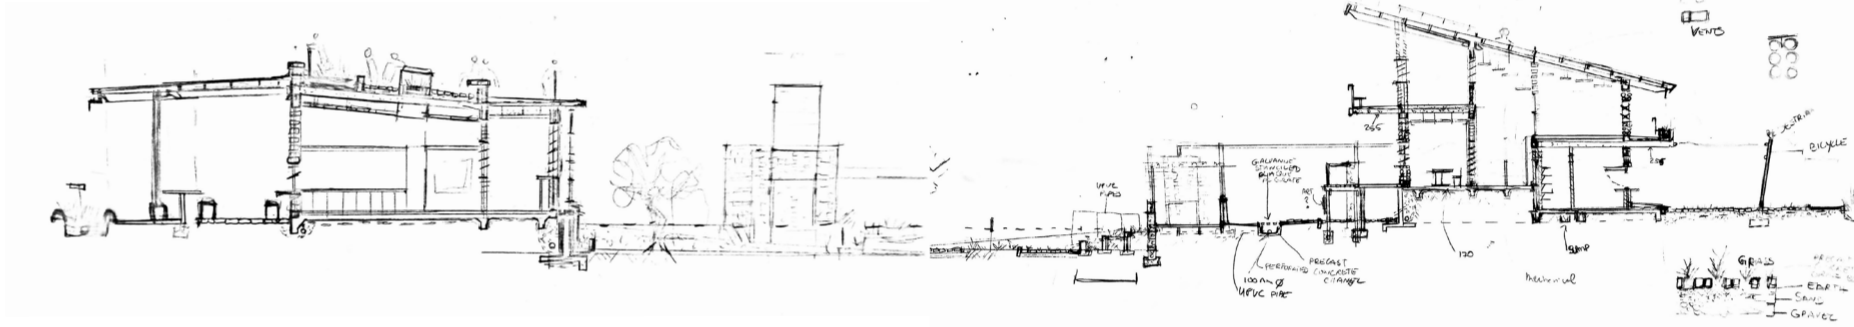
1:100 Sketch section through admin block, garden and seed bank (Author 2021)
